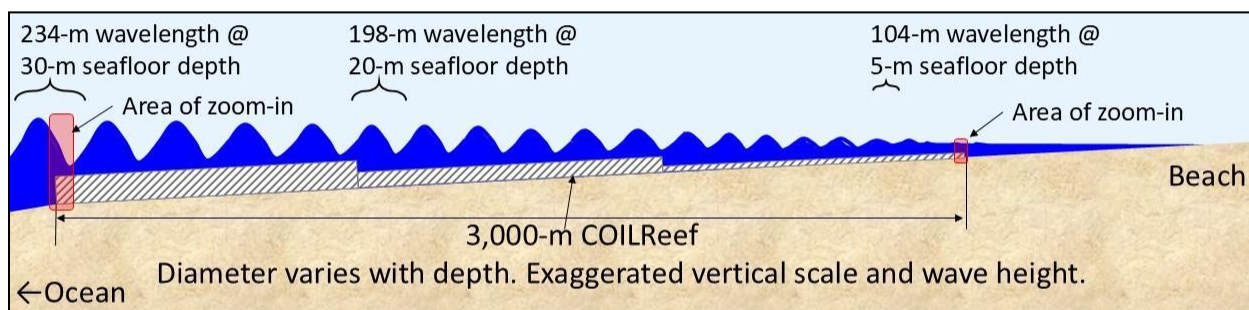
Side overview (elevation) showing the full extent of the living reef foundation
